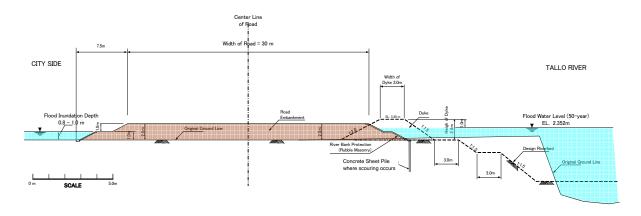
Typical Cross Section for Tallo River Flood Area (Type 4)
